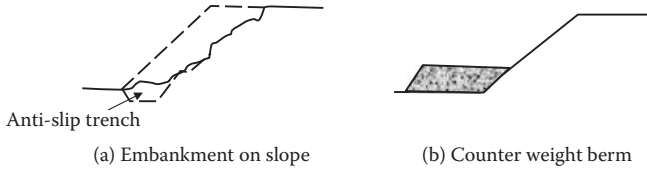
Counterweight berms for stabilizing slopes.
